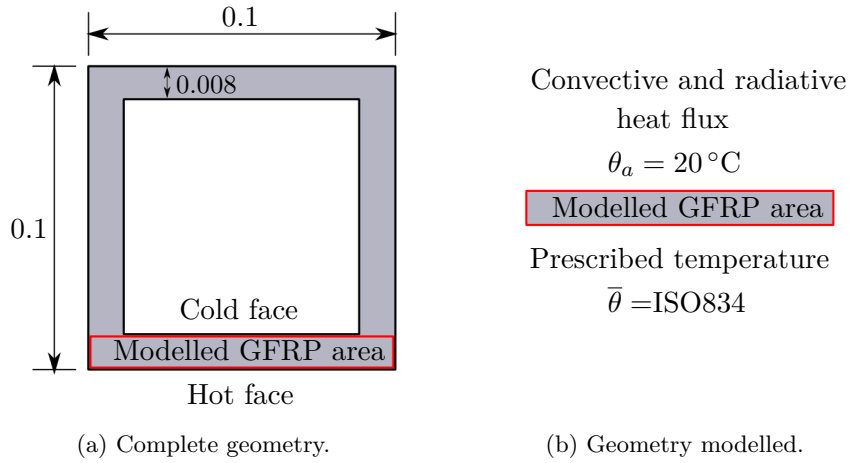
GFRP cross section modelled in Bai *et al.* (2010).
